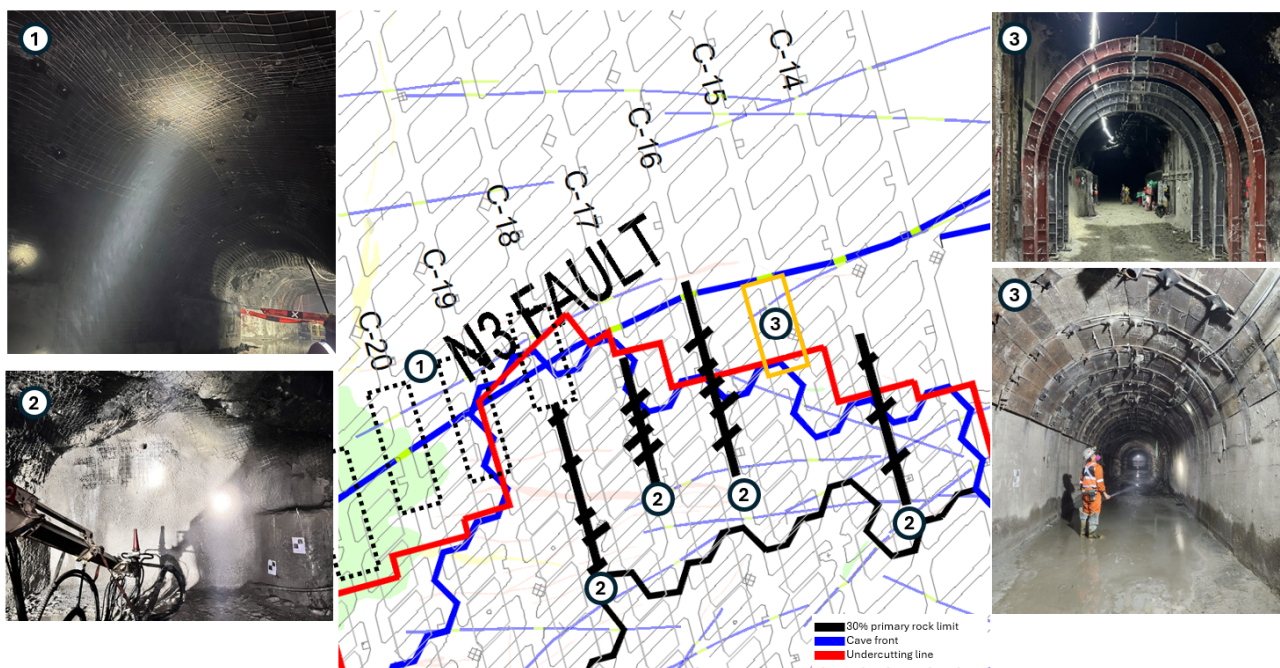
Plan view with the location of each type on ground support to reinforce the collapse area.
